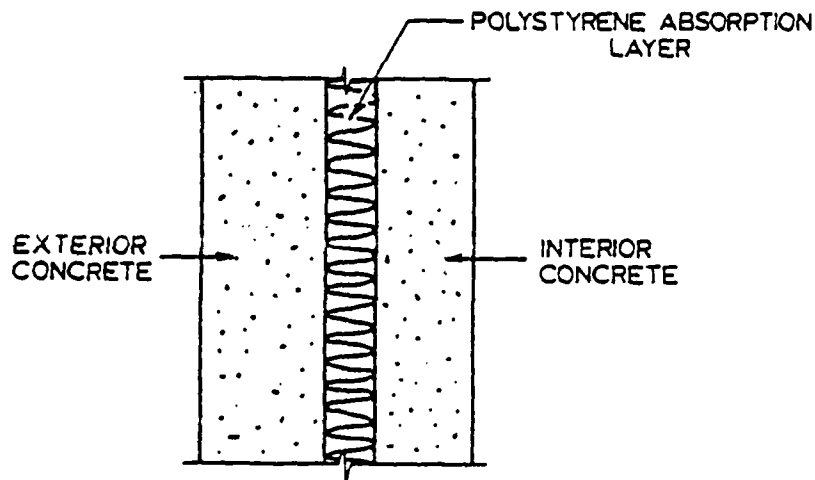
Cross Section of the Concrete-Polystyrene-Concrete (CPC) Layered System.
